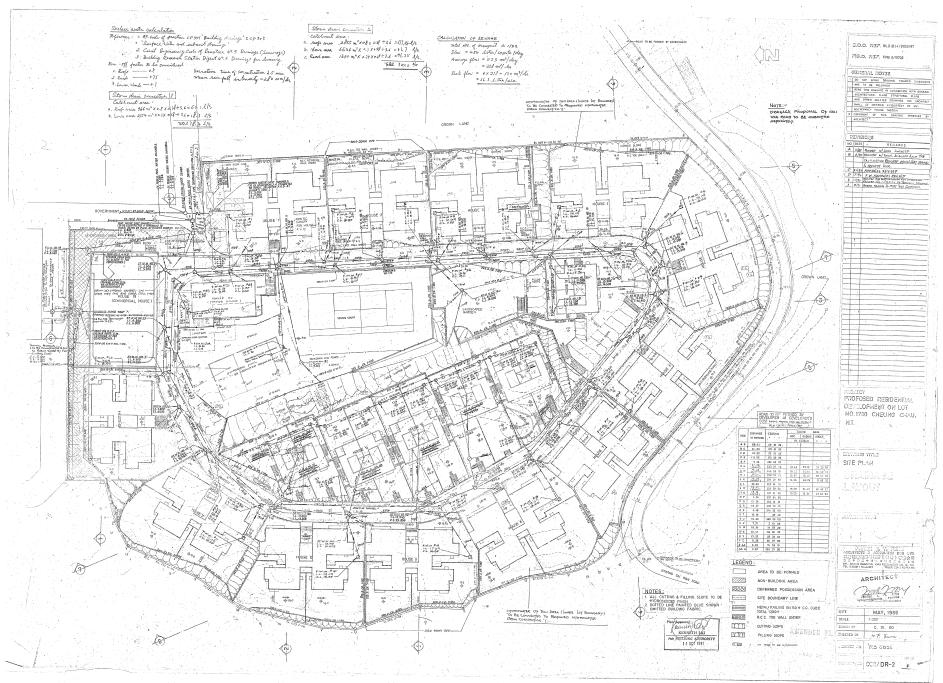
DRAINAGE PLAN OF GREENERY CREST RETRIEVED FROM BD
